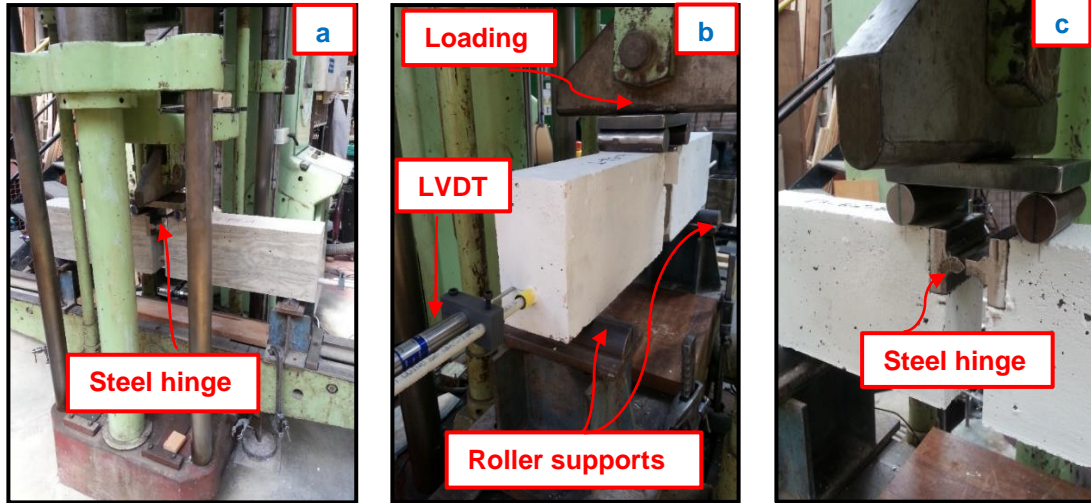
Beam test set-up: (a) front view, (b) side view and (c) steel hinge
